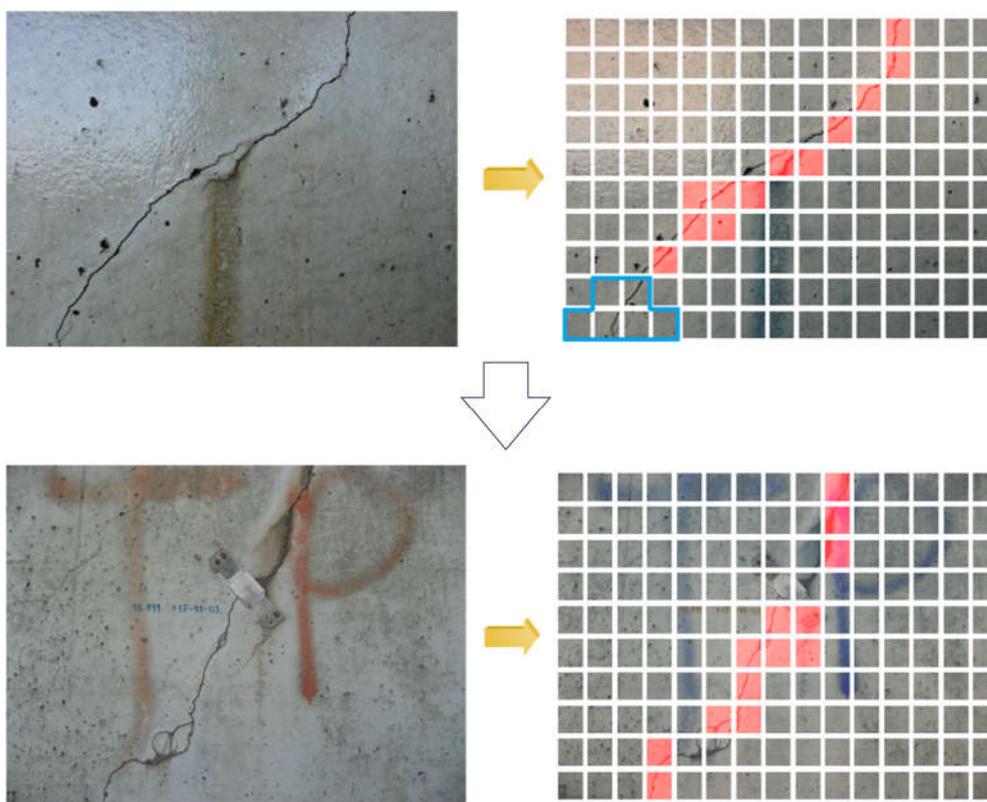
Few-shot crack detection in real bridge inspection images
